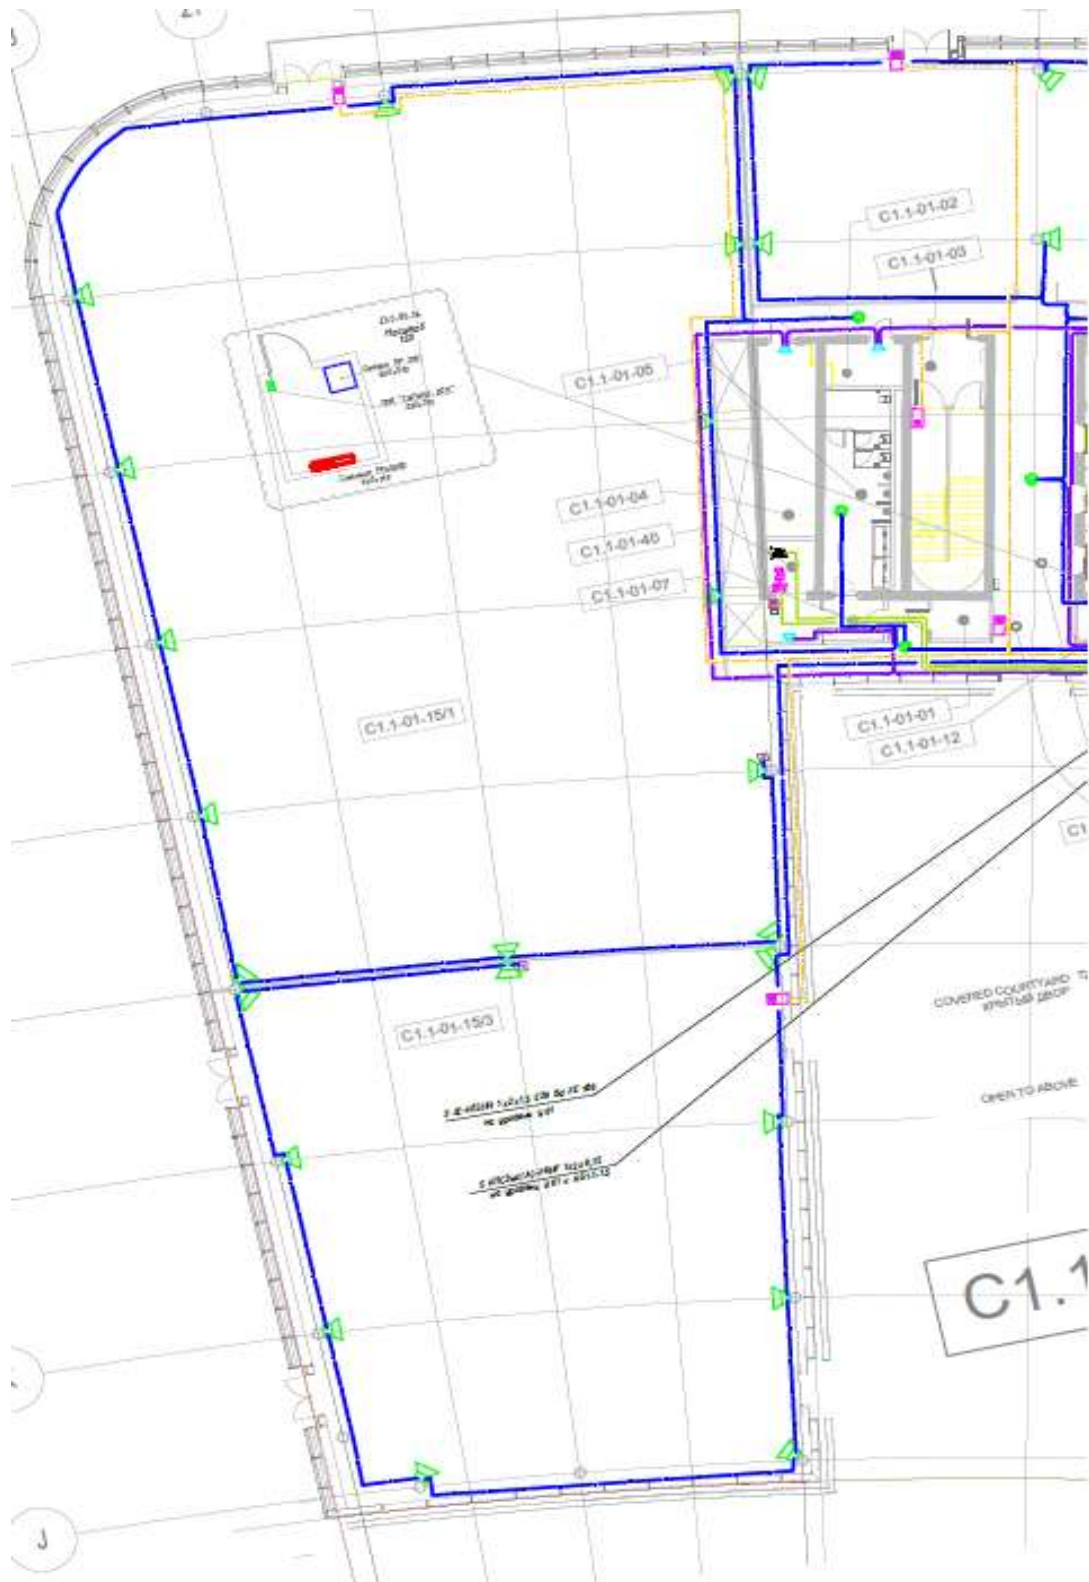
Rough plan of the warning system device layout in the Official Participant's Pavilion on the Facility 1st floor.
